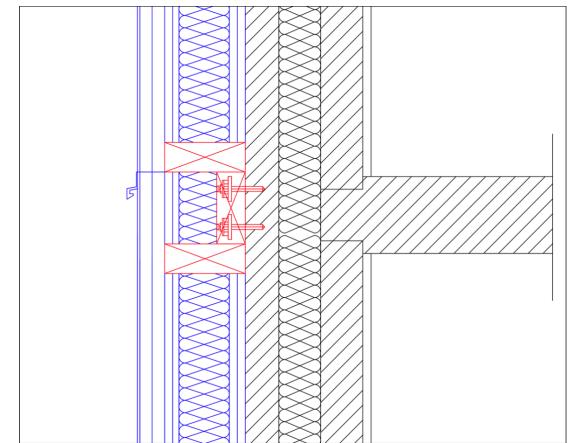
Detail drawing of attachment at the floor slab where the prefabricated facade is attached onto the existing building facade.
